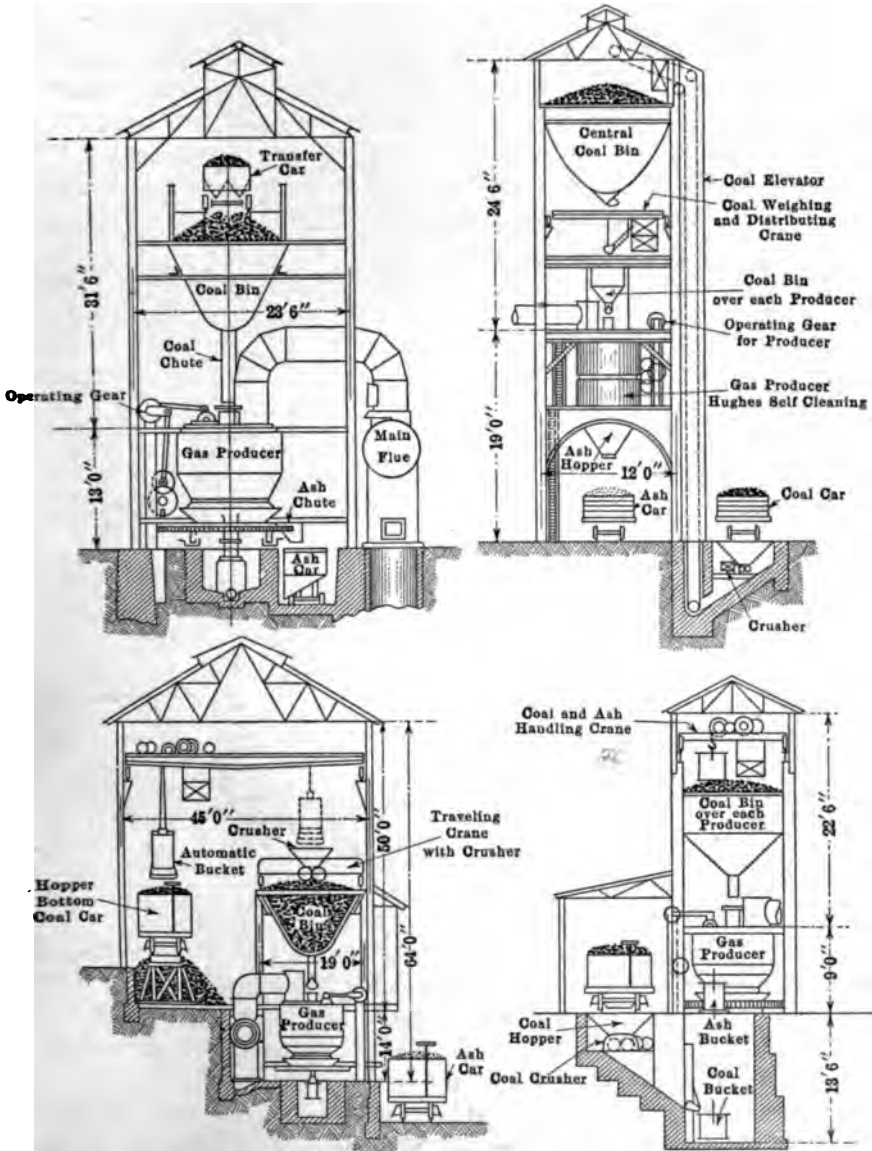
Typical coal-handling apparatus for gas producers or boilers.
